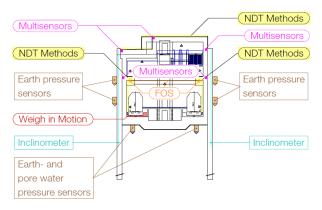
Cross-section of the BIM model in Fig. 1 of the subway station.
